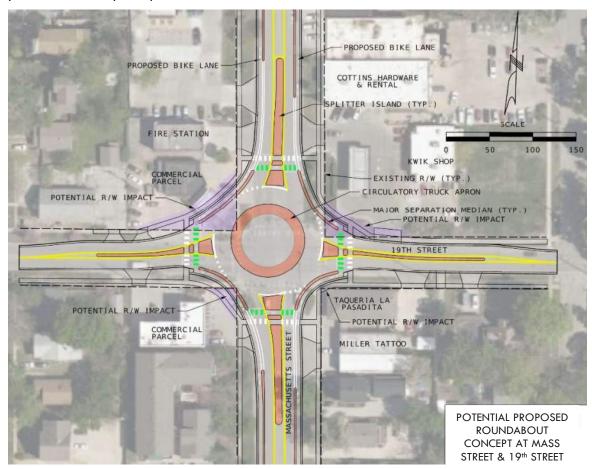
Potential Proposed Roundabout Concept at Mass Street & 19th Street
